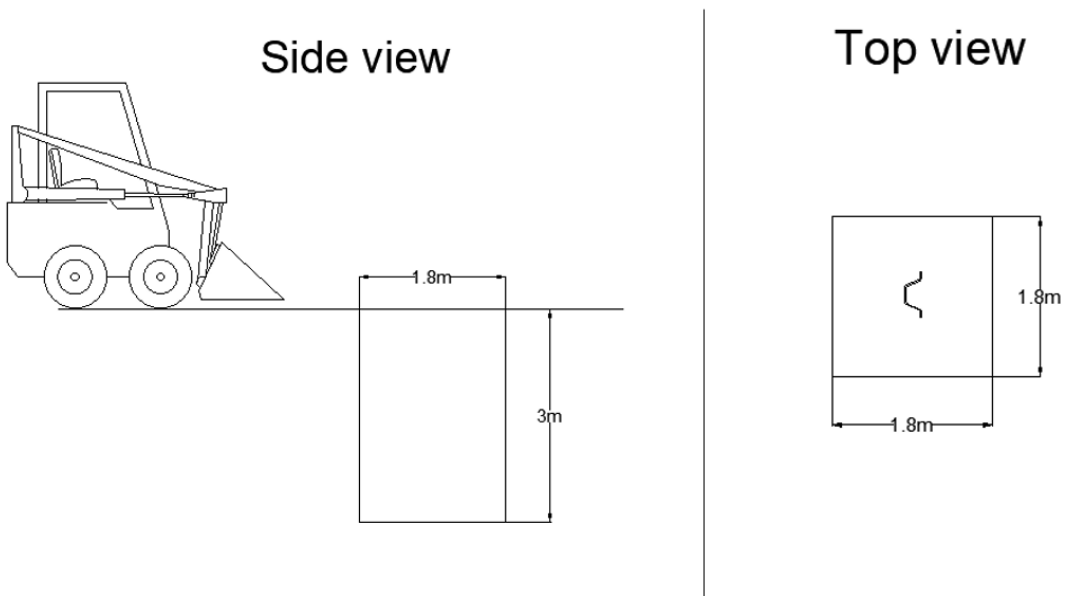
The drawing and dimensions of the test pit with a sheet pile.
